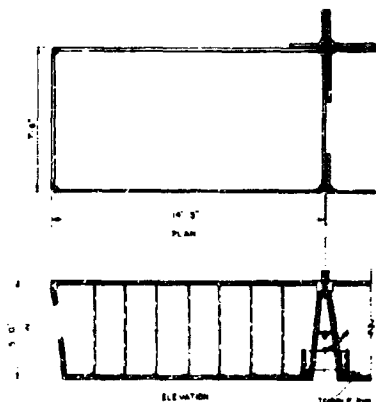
Plan and side elevation views of nestable tank ferrying barges.
